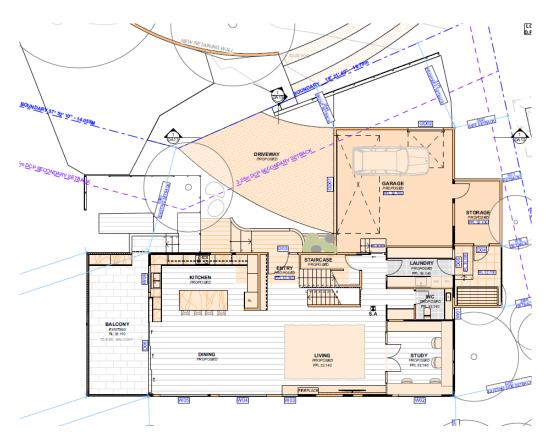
Extract from DA Plan Set (Proposed Ground Floor Plan, Drawing DA08) showing the proposed front setback to the new garage
